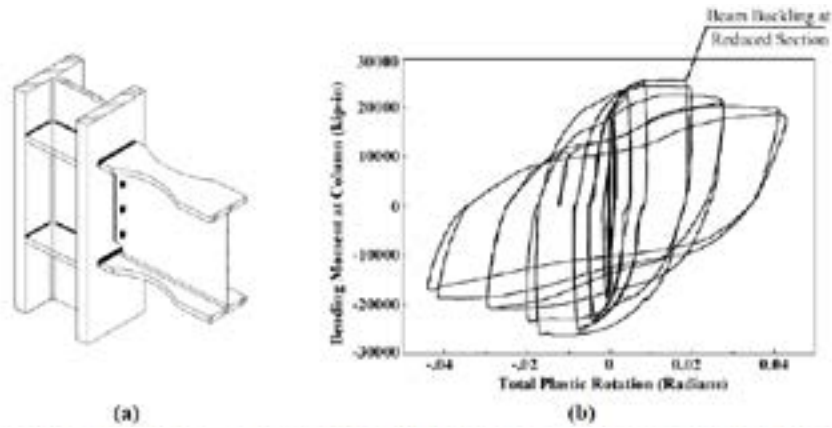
Reduced beam section connection (RBS): (a) connection arrangement and
